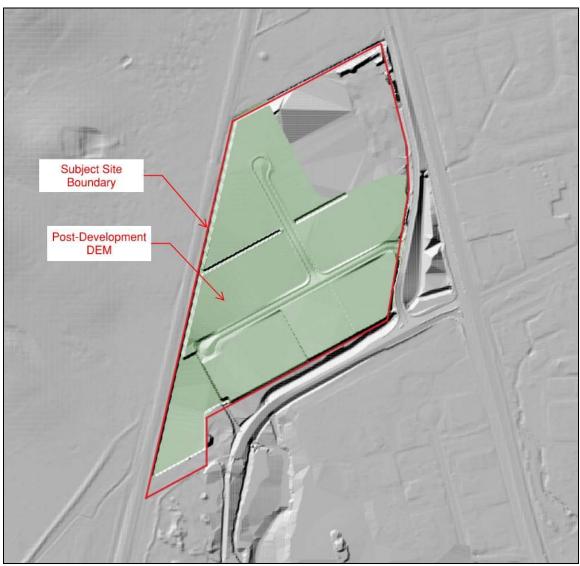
Proposed earthworks design surface Digital Elevation Model (DEM) provided by the client
